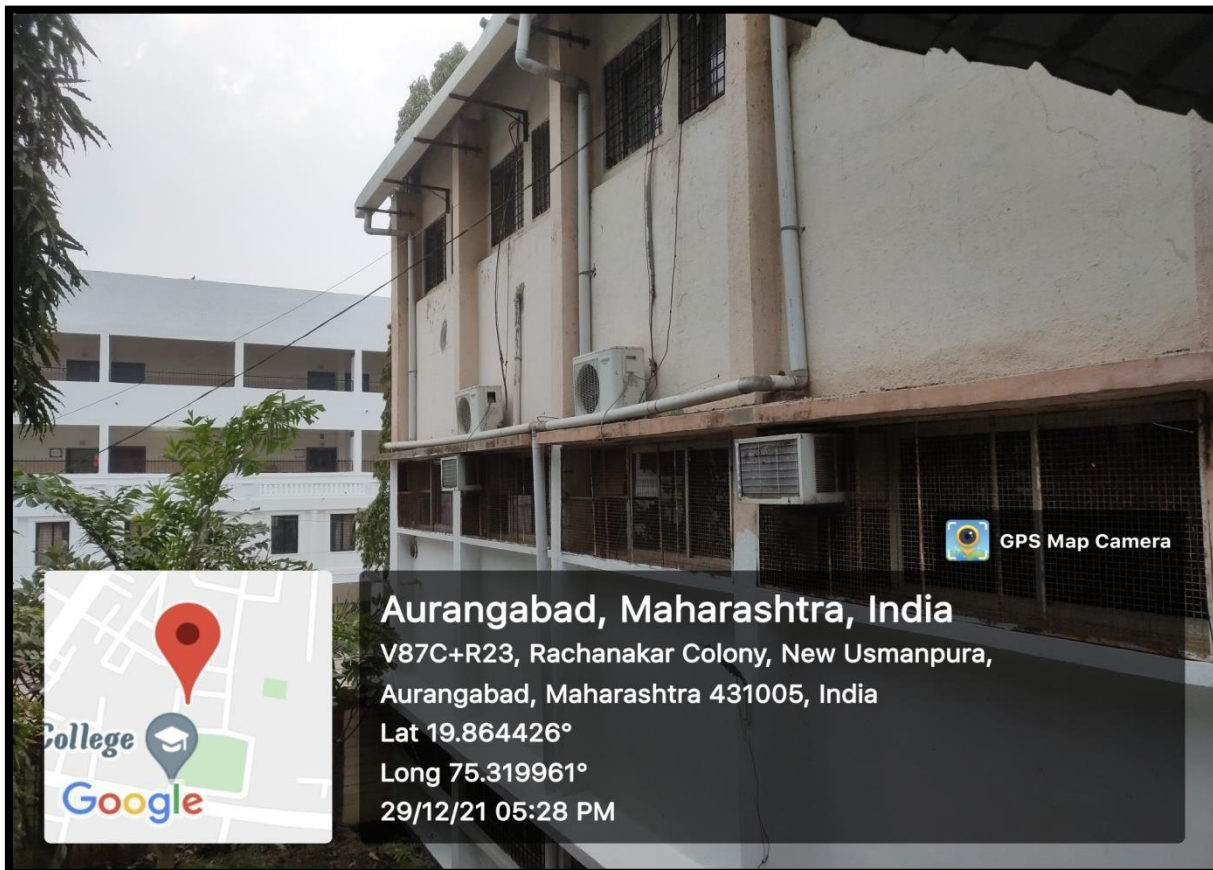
and 14 - Rainwater Conduit Pipelines on College building
